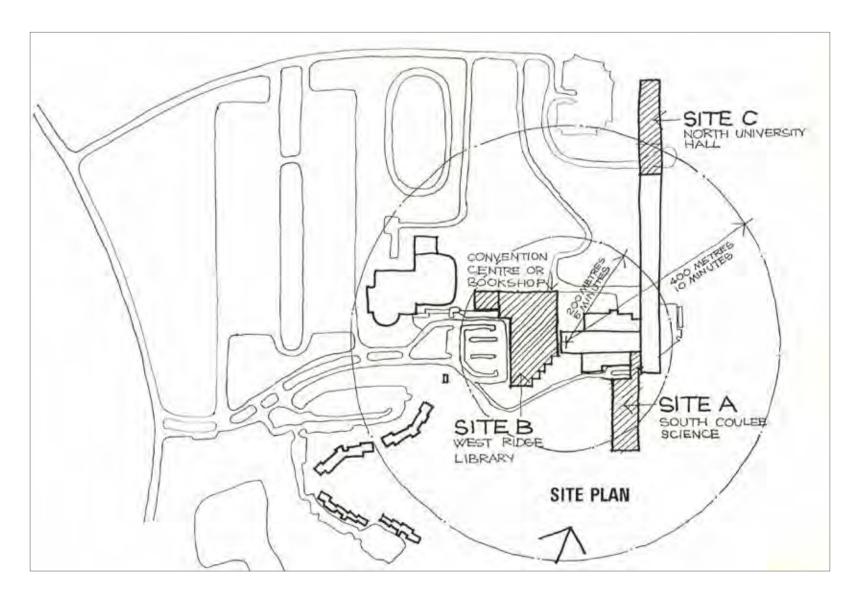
| CAMPUS DEVELOPMENT PLAN (1993)
